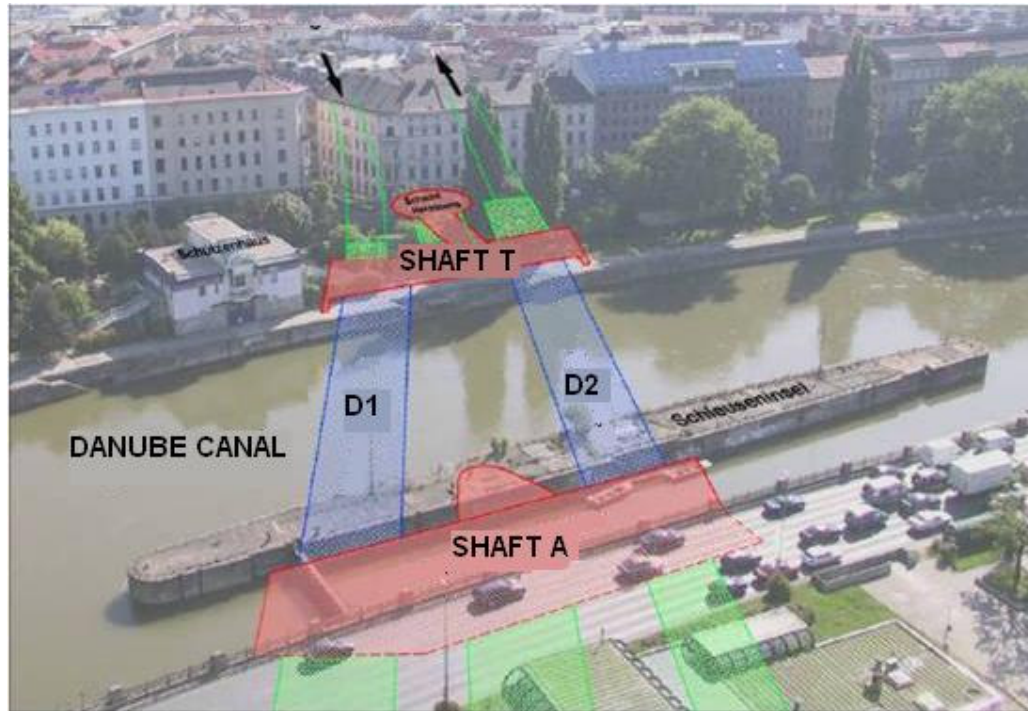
Layout plan of Danube canal under-crossing (Jöstl and Co., 2003)
